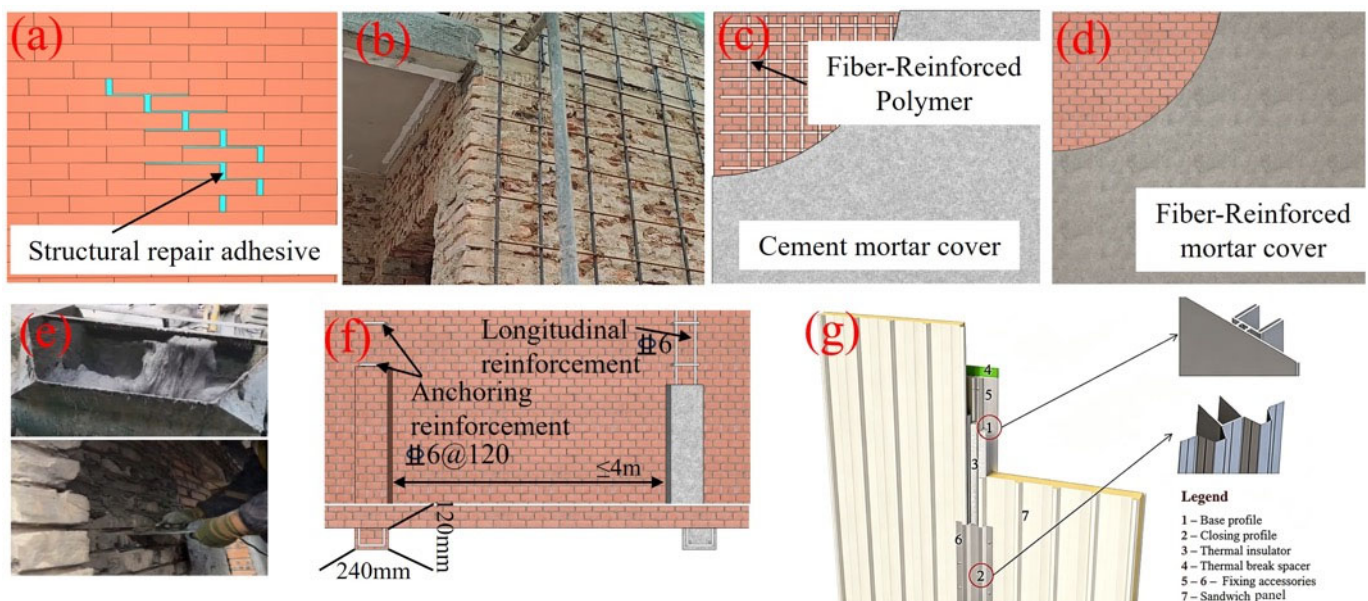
Wall load-bearing capacity enhancement measures. (a) Wall crack repair; (b) externally bonded steel mesh reinforcement; (c) externally bonded fiber-reinforced polymer reinforcement; (d) enhanced mortar rendering; (e) addition of buttresses; (f) addition of buttresses; (g) MIL 15.s Eco-Seismic Insulation System [39].
